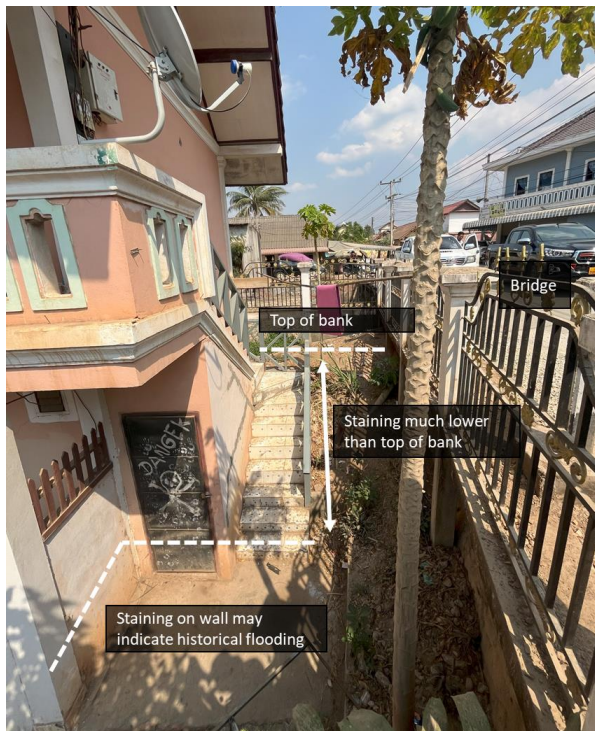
Private building adjacent to Huai Mao Bridge (northern edge of bridge)
